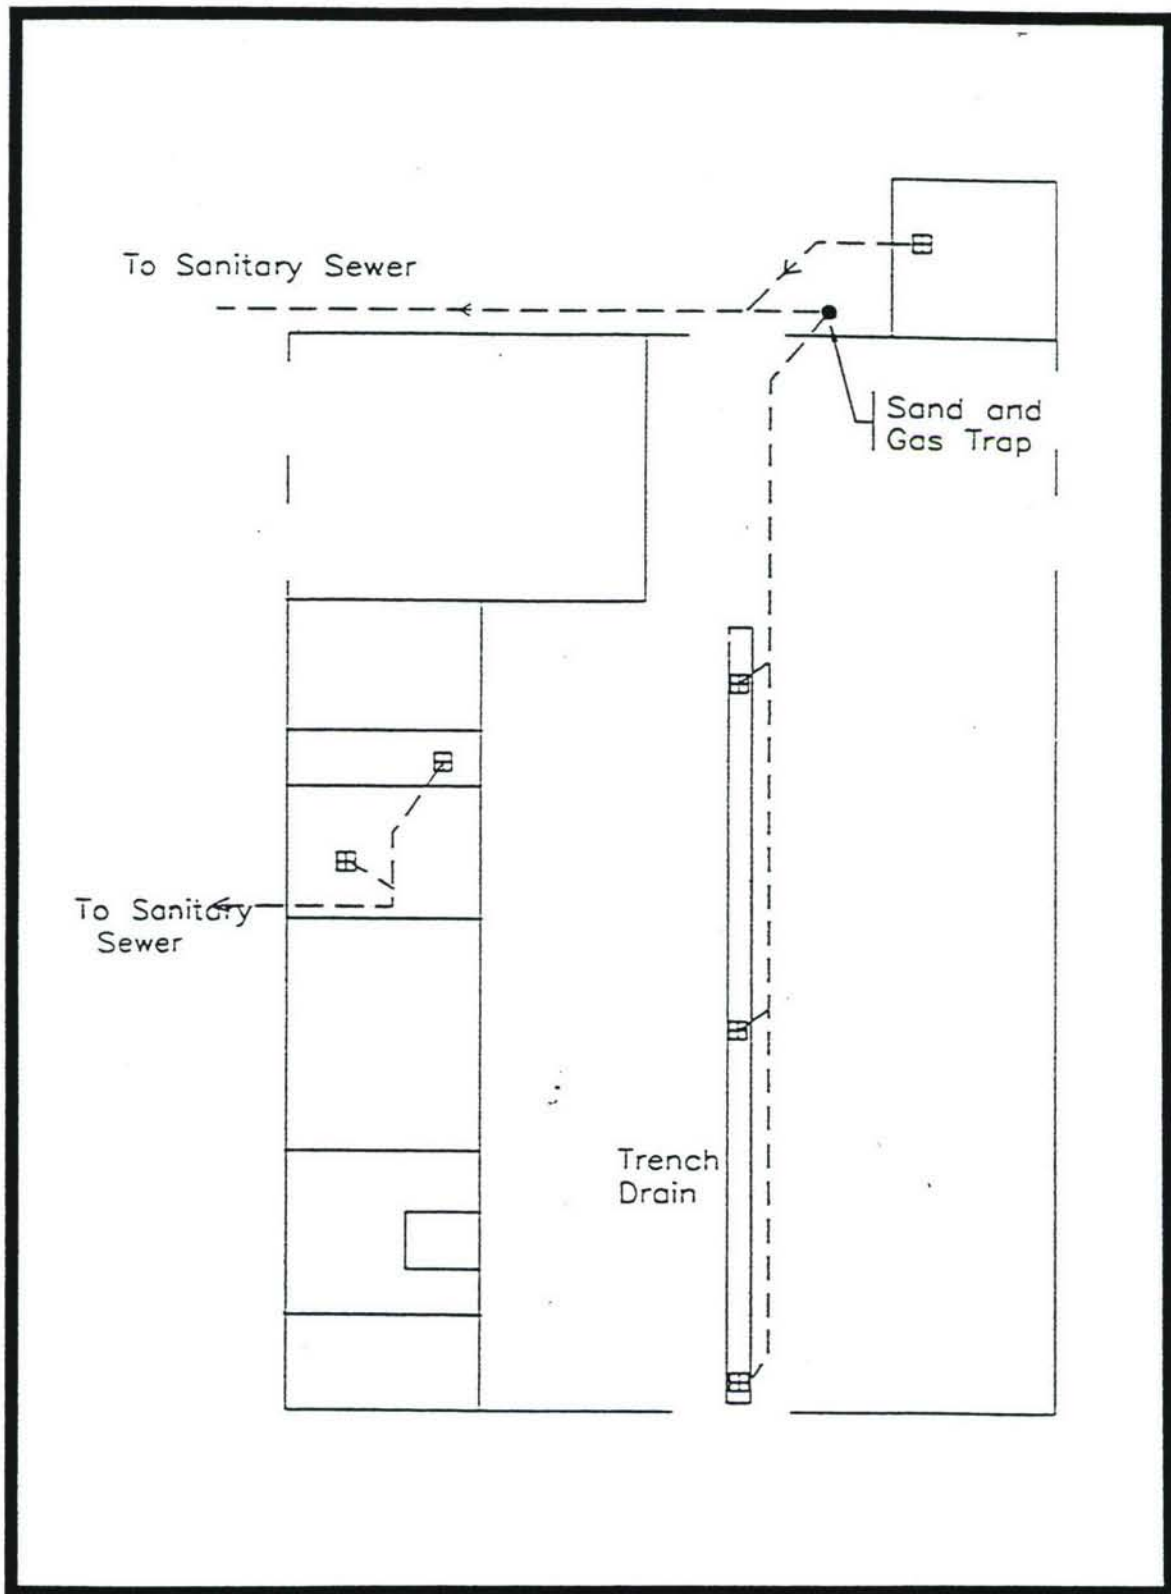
Location of floor drains, sand and "gas" trap, and sanitary sewer connections.
